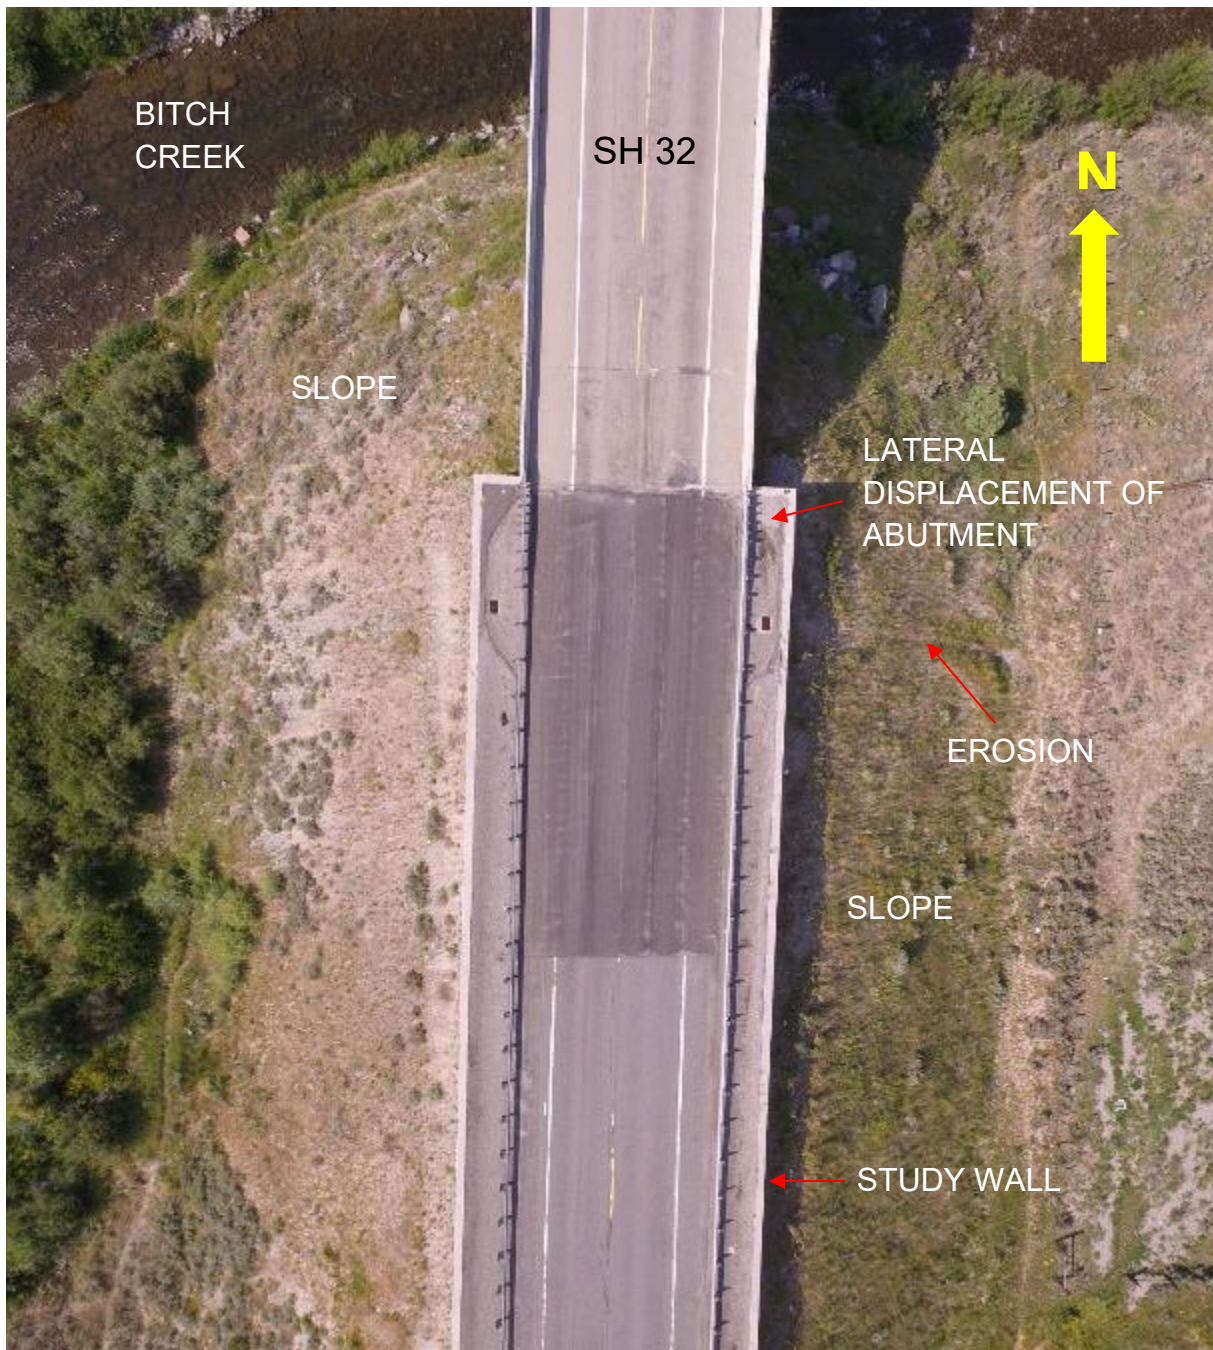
Damage Map of East MSE Wall at South Abutment of Bitch Creek Bridge, SH-32
